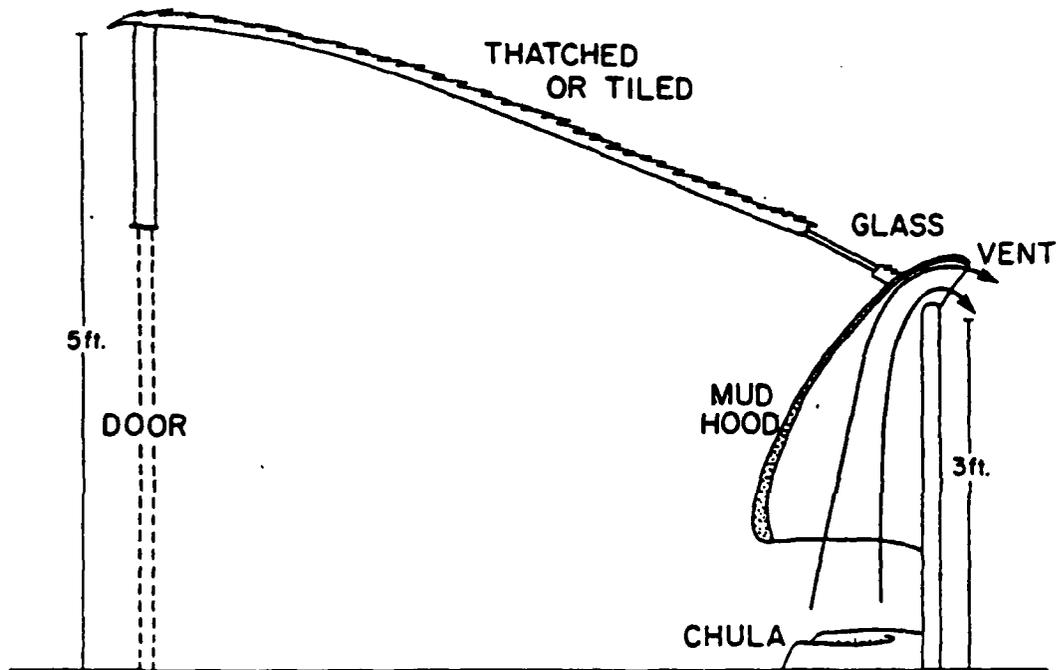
Sketch of proposed rural kitchen with mud hood and shorter wall adjacent to chula, door placed on the wall opposite to chula and a glass pane on the roof.
